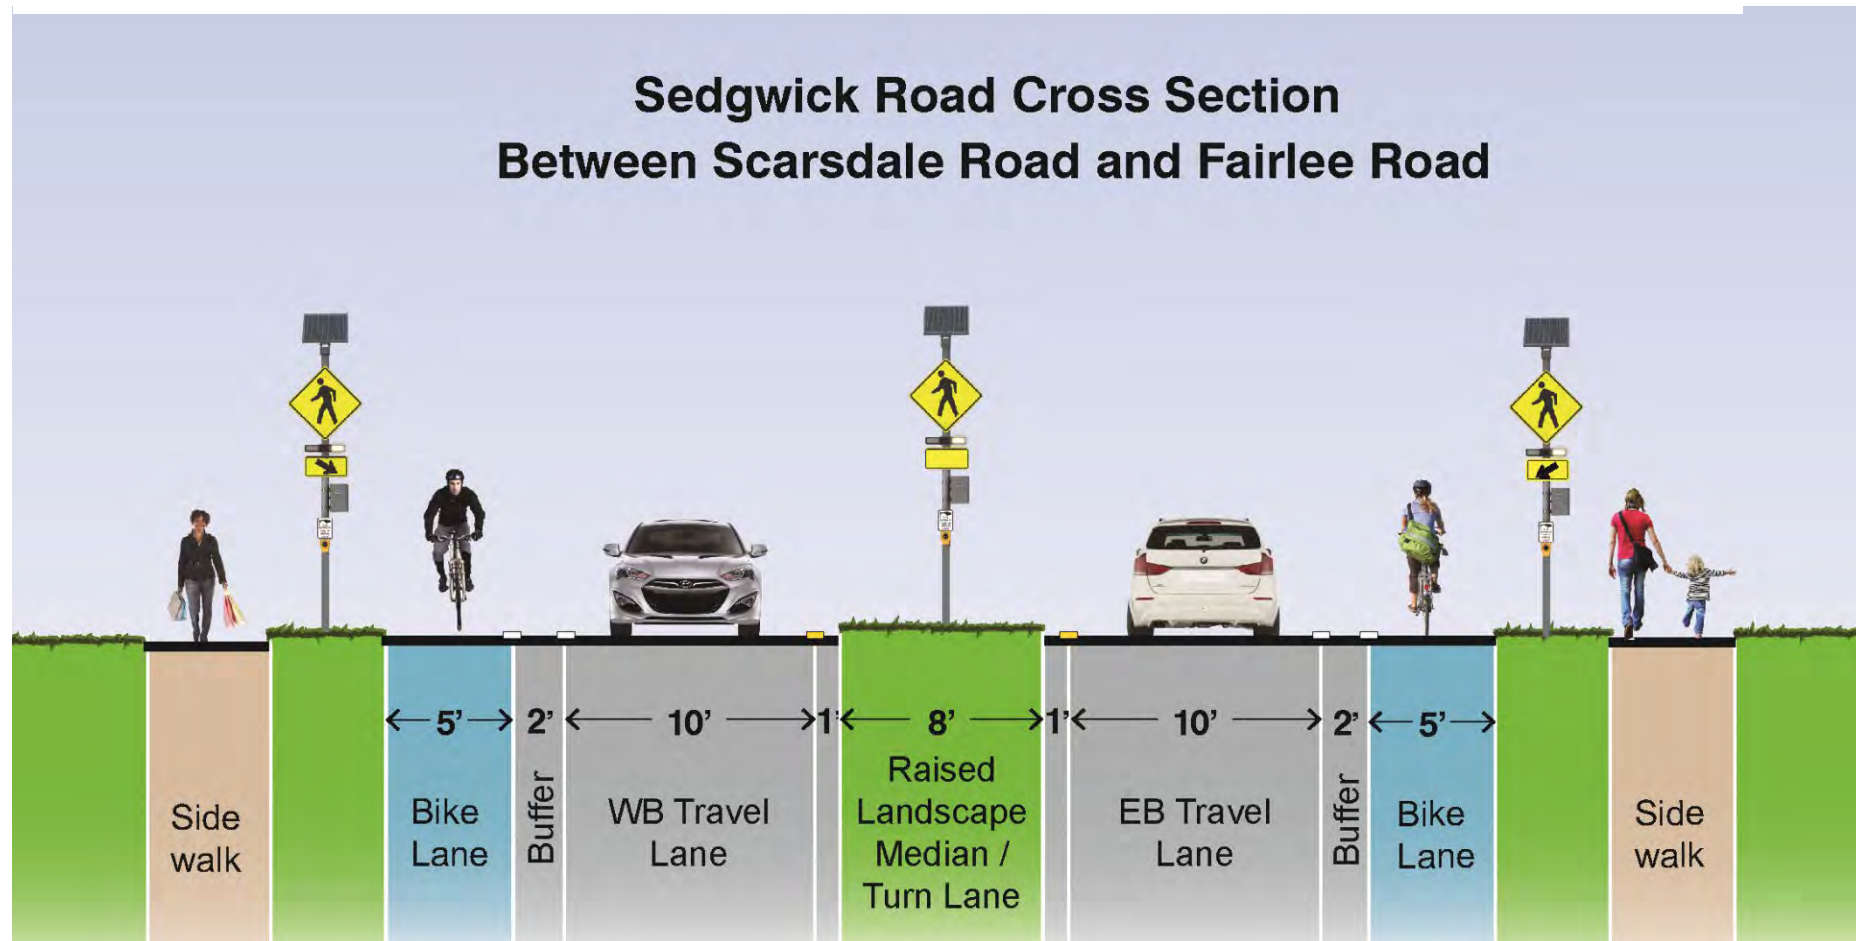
Sedgwick Road Cross Section, Scarsdale Road to Fairlee Road
